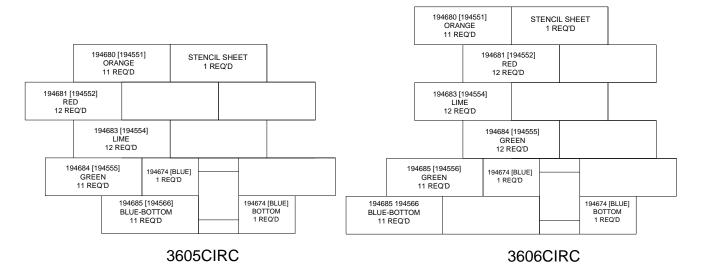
Wall Sheet Layouts — 33' CIRC Bins
